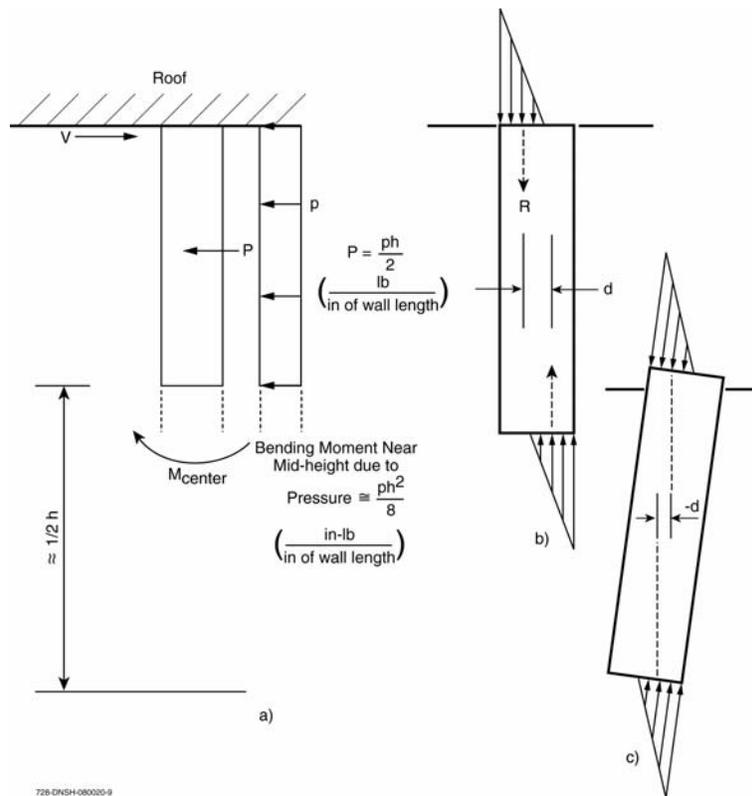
(a) Bending moments in vertical walls reacting pressure loads; (b) Bending in masonry wall with low tensile strength mobilizing compression; (c) Instability failure of masonry wall with insufficient bending strength
